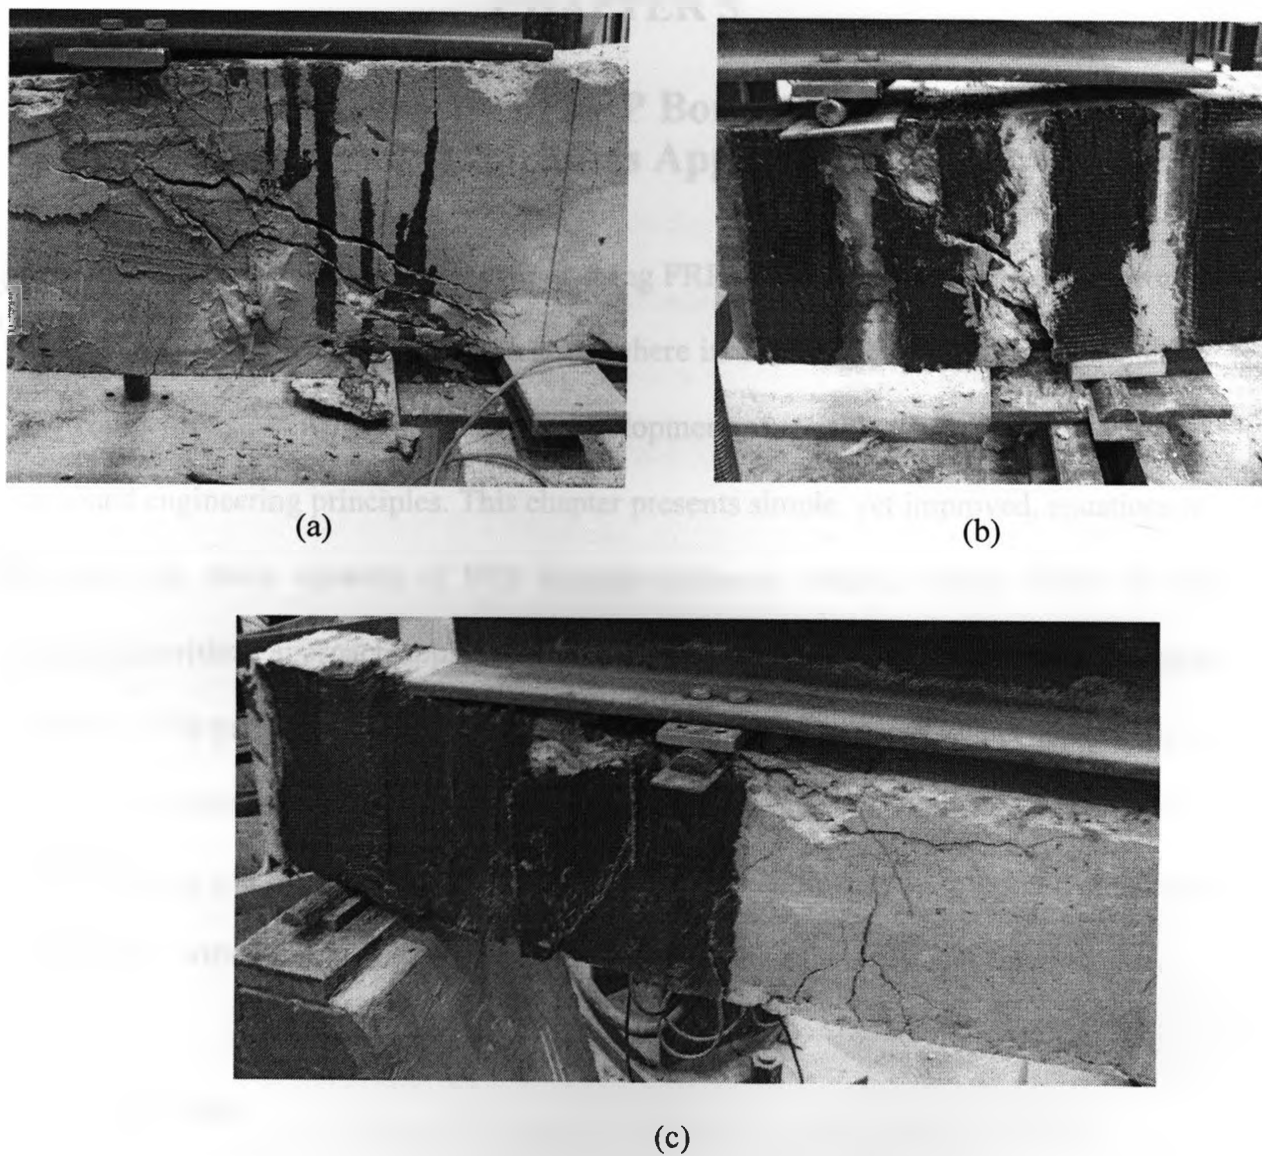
Shear failure and crack pattern for, (a) As-Built-R beam specimen, (b) B-I-CR1 beam specimen, and (c) B-I-CR2 beam specimen.
